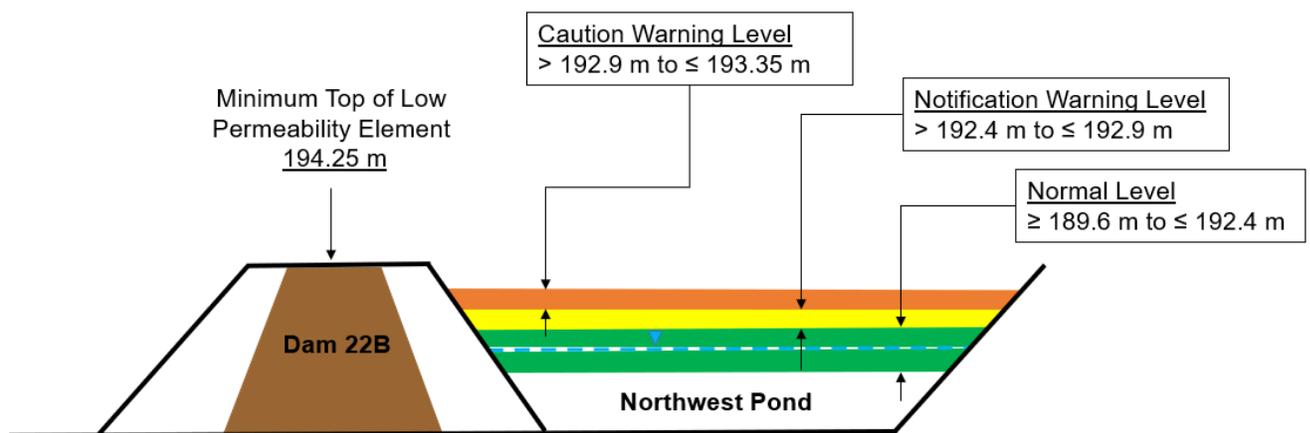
Water and Infrastructure Elevations for Northwest Pond (not to scale)
